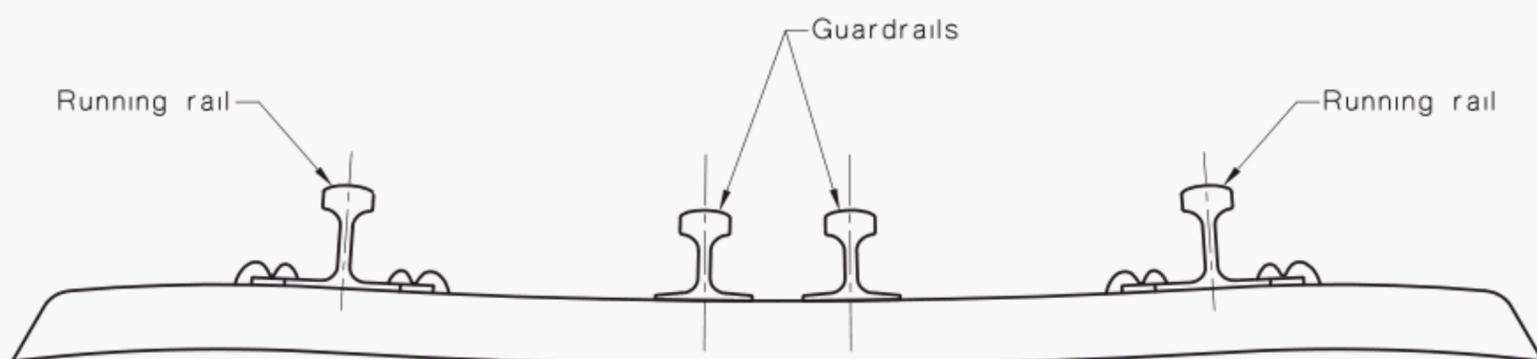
TYPICAL GUARDRAIL SLEEPER
